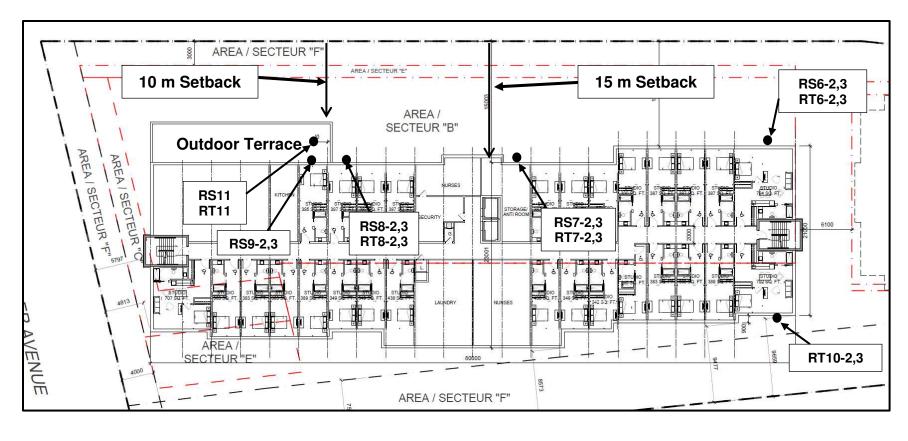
2<sup>nd</sup> & 3<sup>rd</sup> Floor Plan, 175 Richmond Road, 6-storey Building
